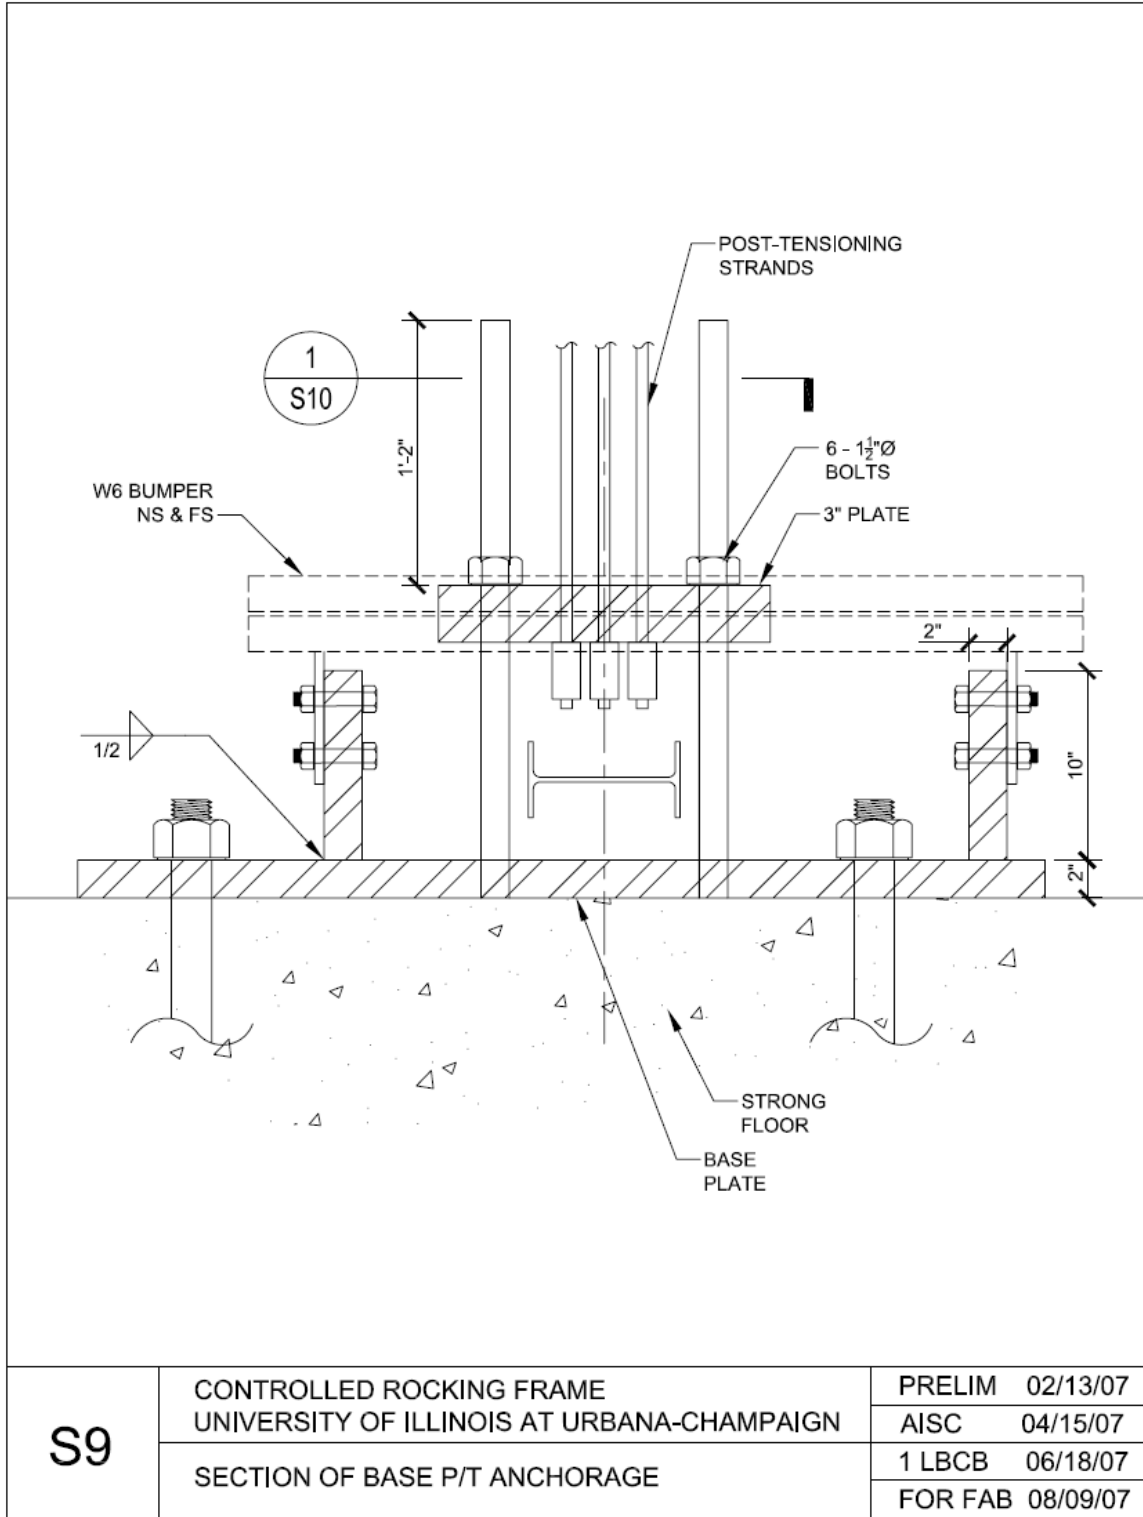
Specimen Design Drawing – Section of Base Post-Tensioning Anchorage
